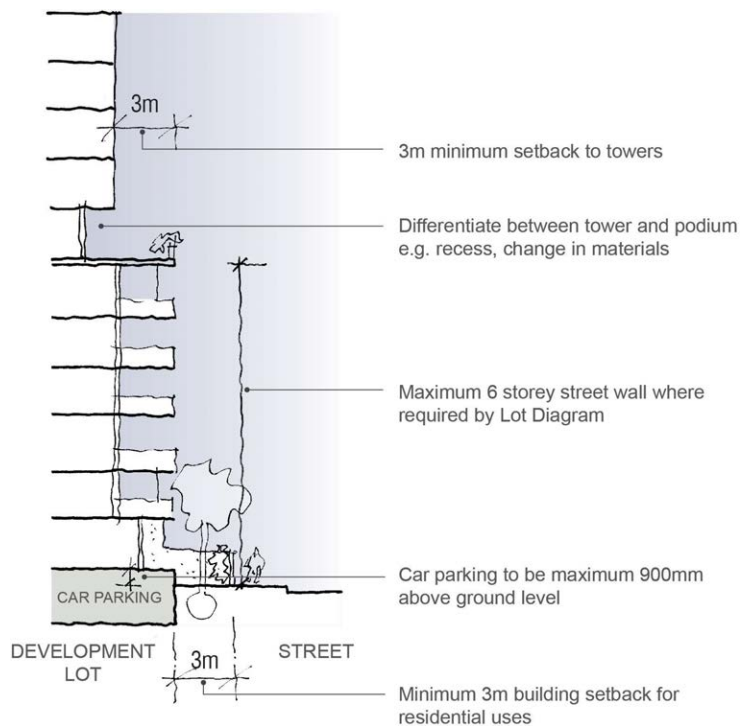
Typical Street wall heights and tower setbacks
